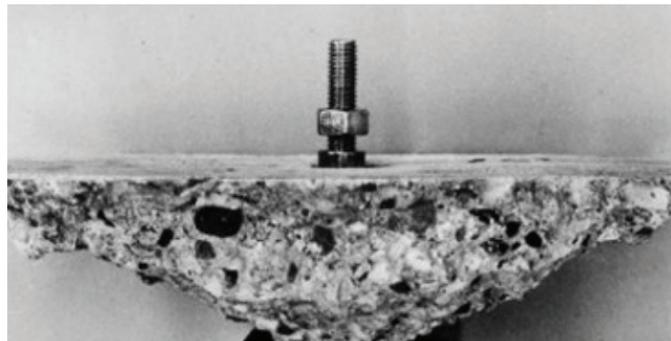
Concrete cone in tension. (Picture from Anchorage in Concrete Construction, R. Eligehausen).
